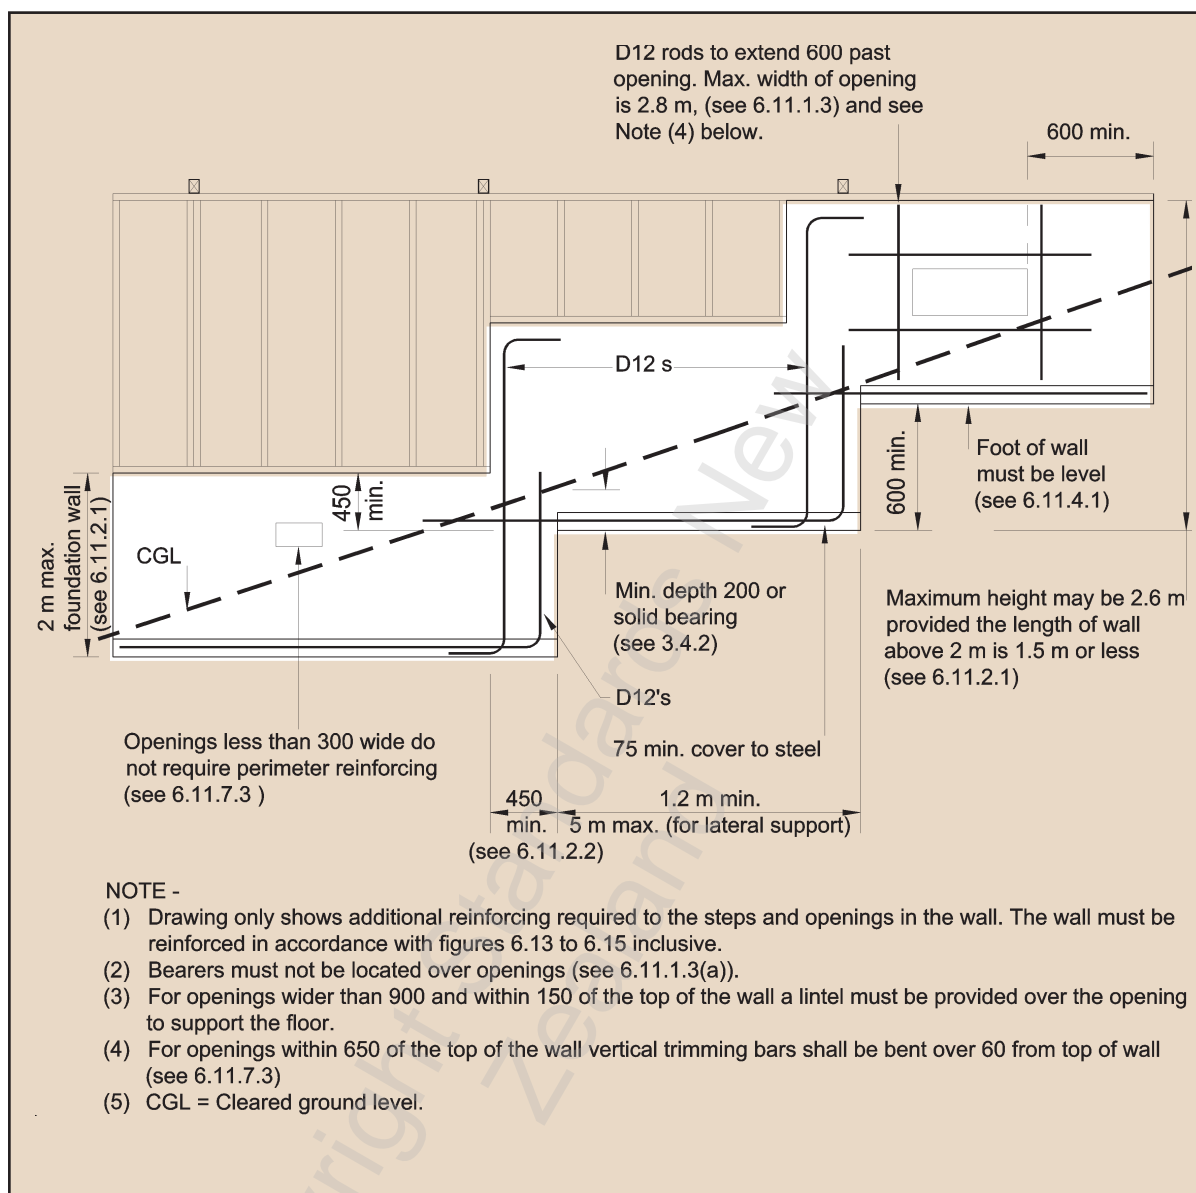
Foundation walls (see 6.11.2.1)
